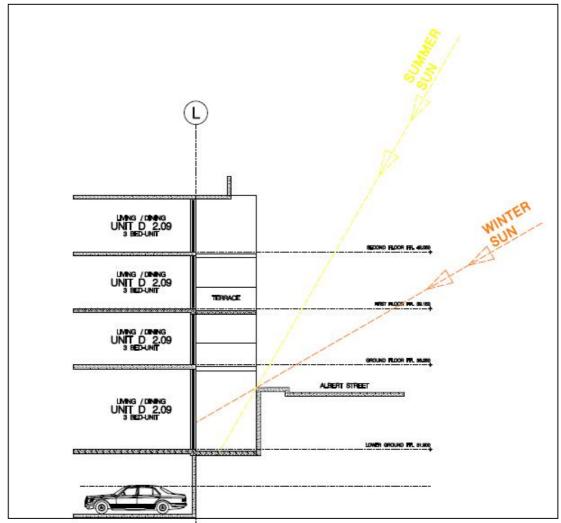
Sun access diagram for units facing Albert Street in Building 3
